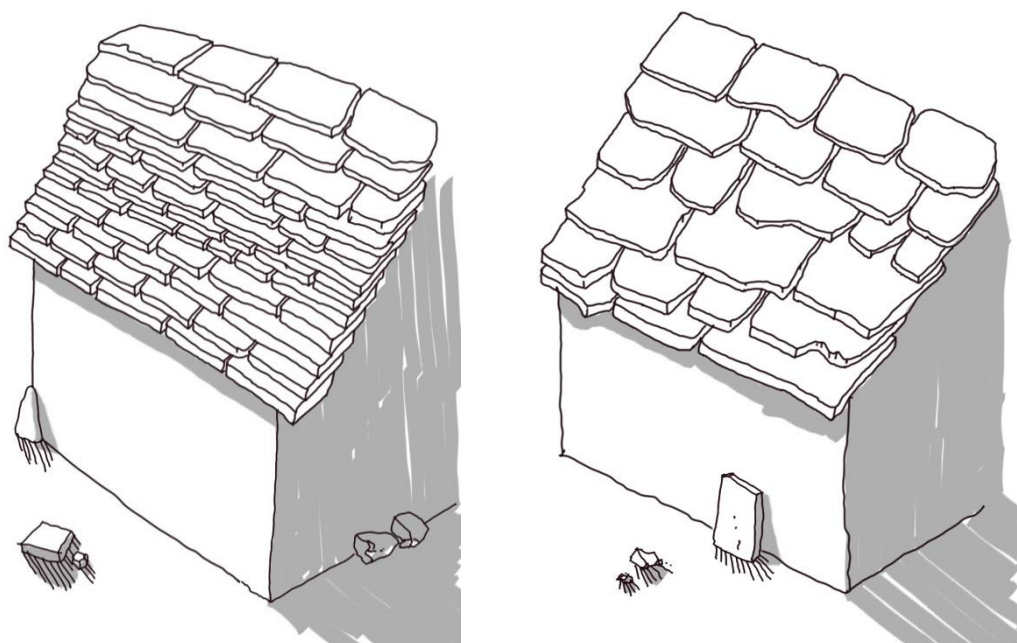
Two examples of roof cladding: exact and rough type of cladding. The denser stones are laid the thicker the roof is. Overlapping plates range from 3 up to 5 layers. Layers of stones may reach up to 25 cm (exact) or 10 cm (rough).
